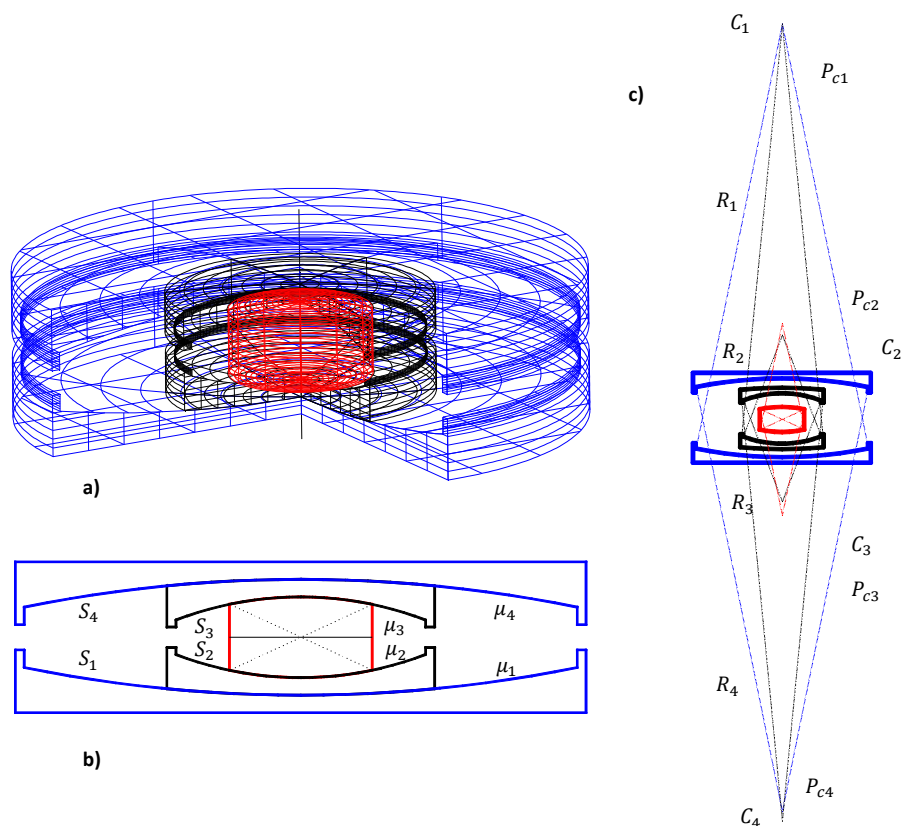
Triple Friction Pendulum device: a) axonometric section, b) plan section, and c) exploded plan section.
